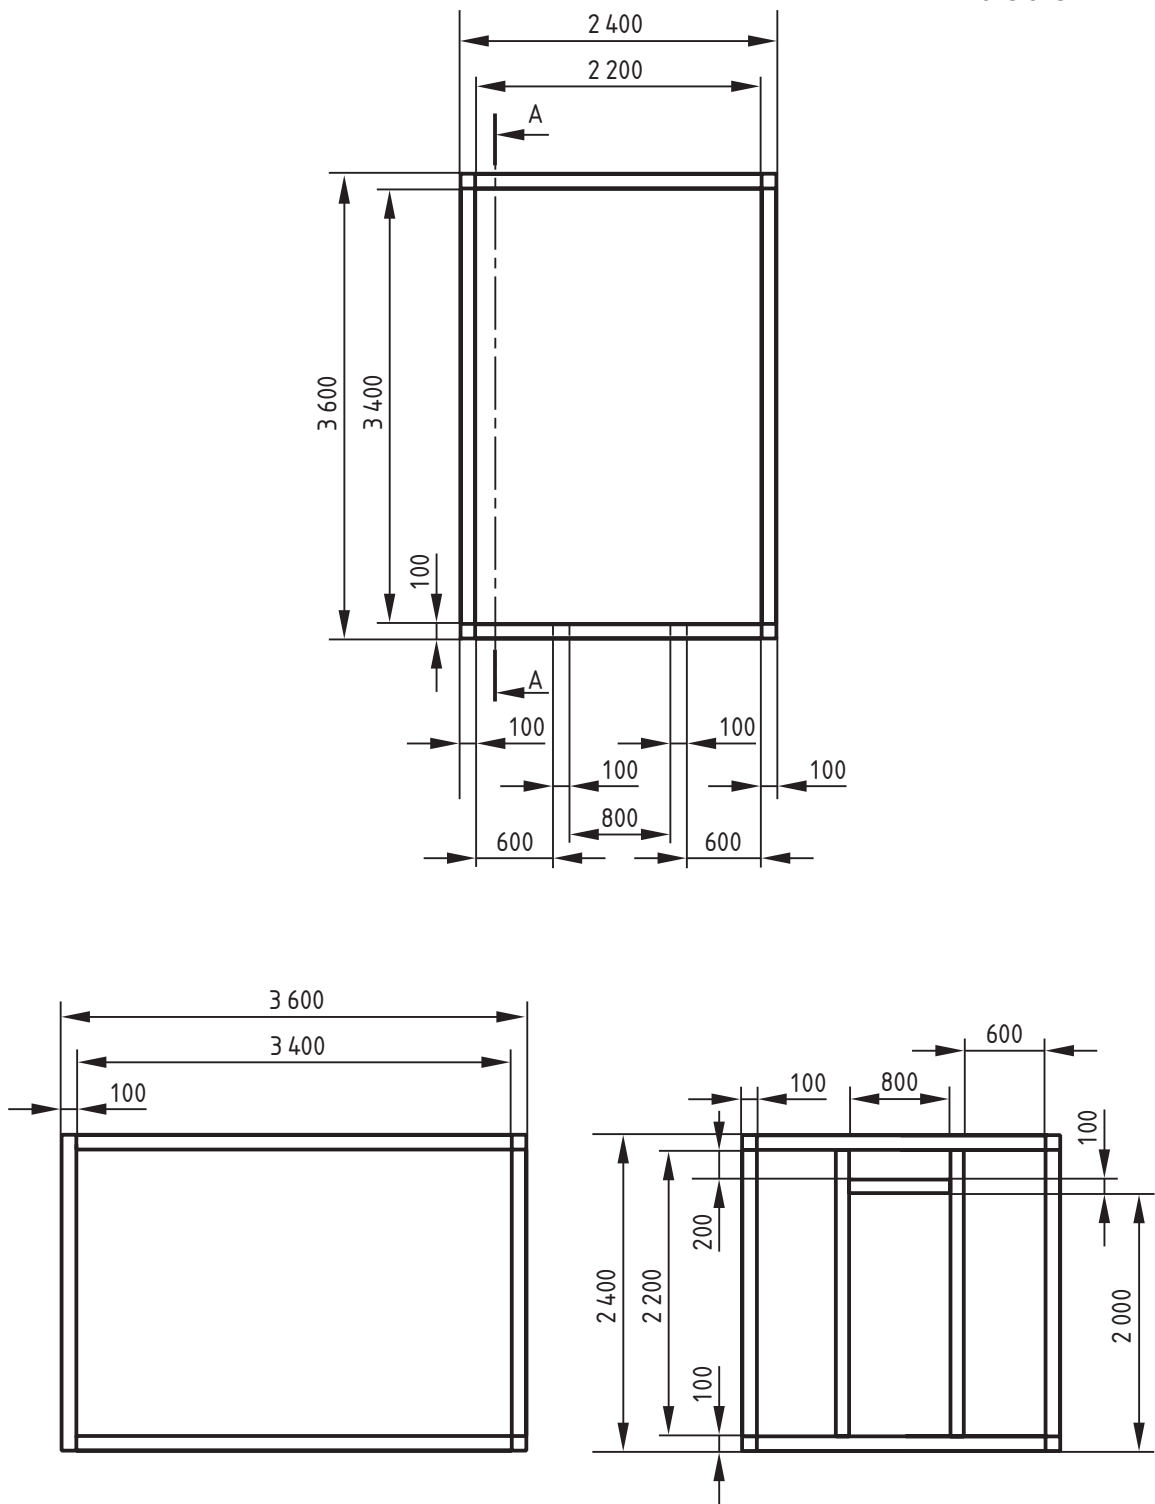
Example of internal structural framework (plan, section A-A, front view)
